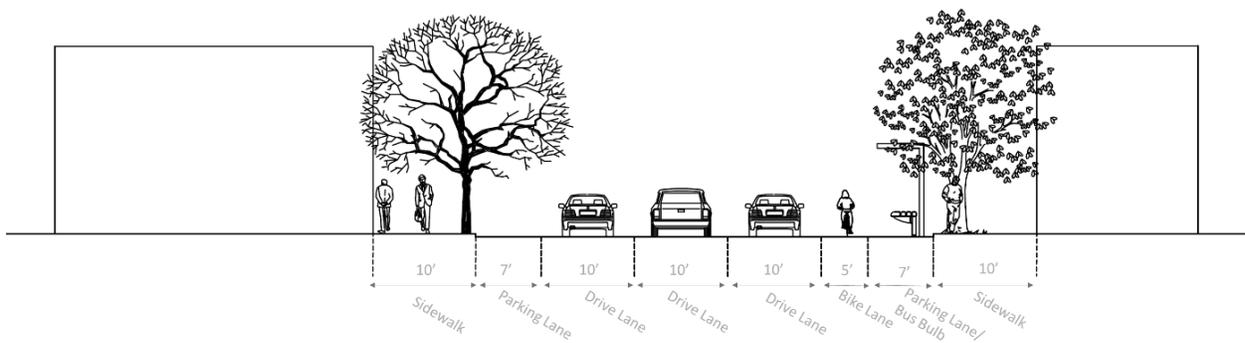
Section view of proposed design for 14th St. & Temple St.
